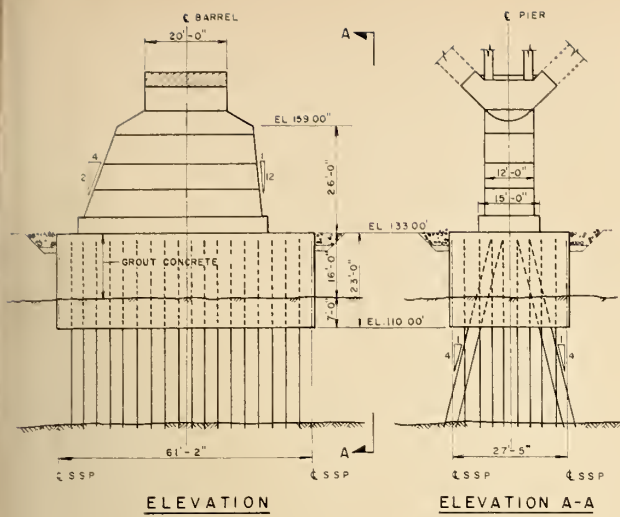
Typical Pier (Piers 1, 3, 5 and 6).
